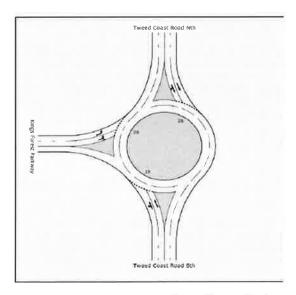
Interim and Ultimate Intersection Arrangements for Tweed Coast Road and Kings Forest Parkway
